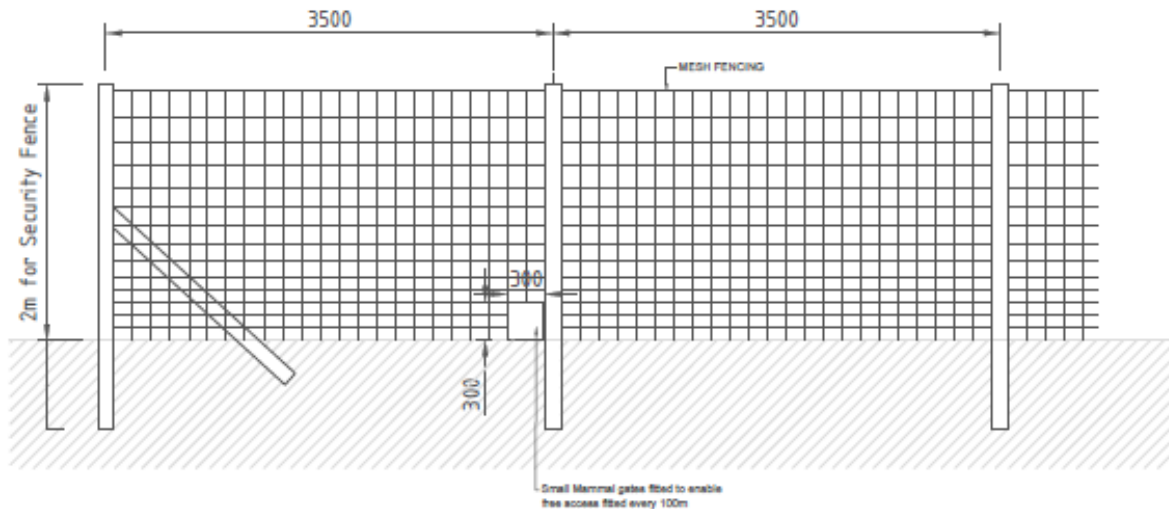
Typical mesh fencing elevation. (Source: BNRG.)
